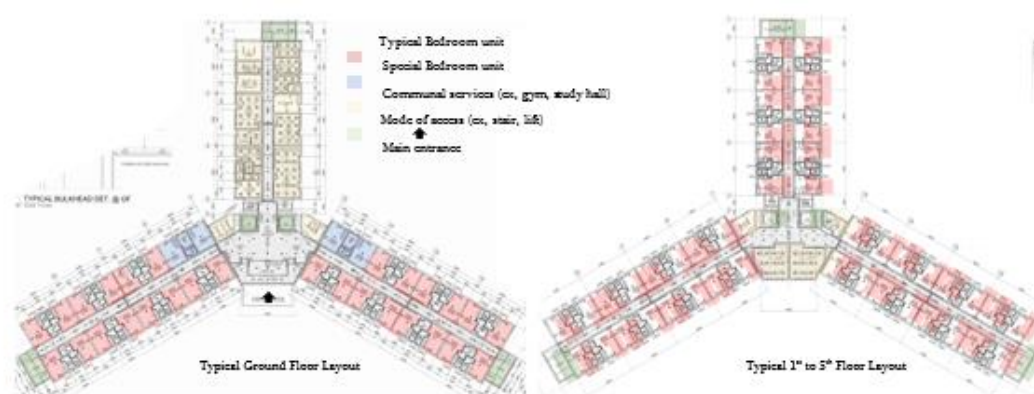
Typical ground and 1st to 5th floor layouts of Maqam 4 hostel.
